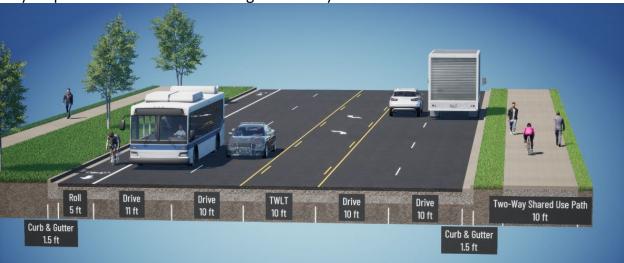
112th Avenue proposed long-term improvements north of 18th Street
